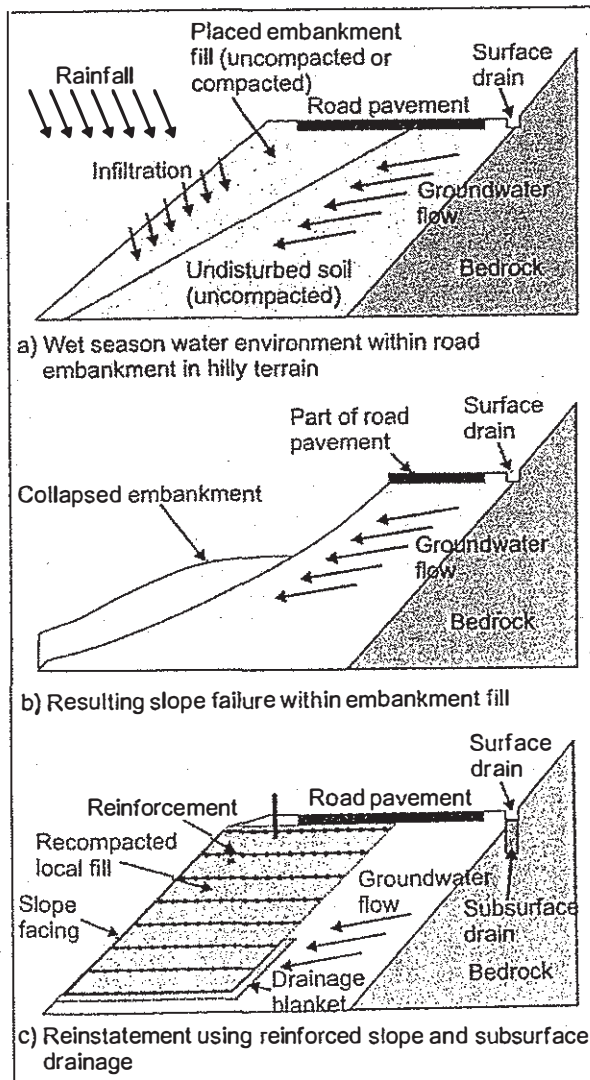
Reinstatement of failed fill slopes following heavy rainfall.
